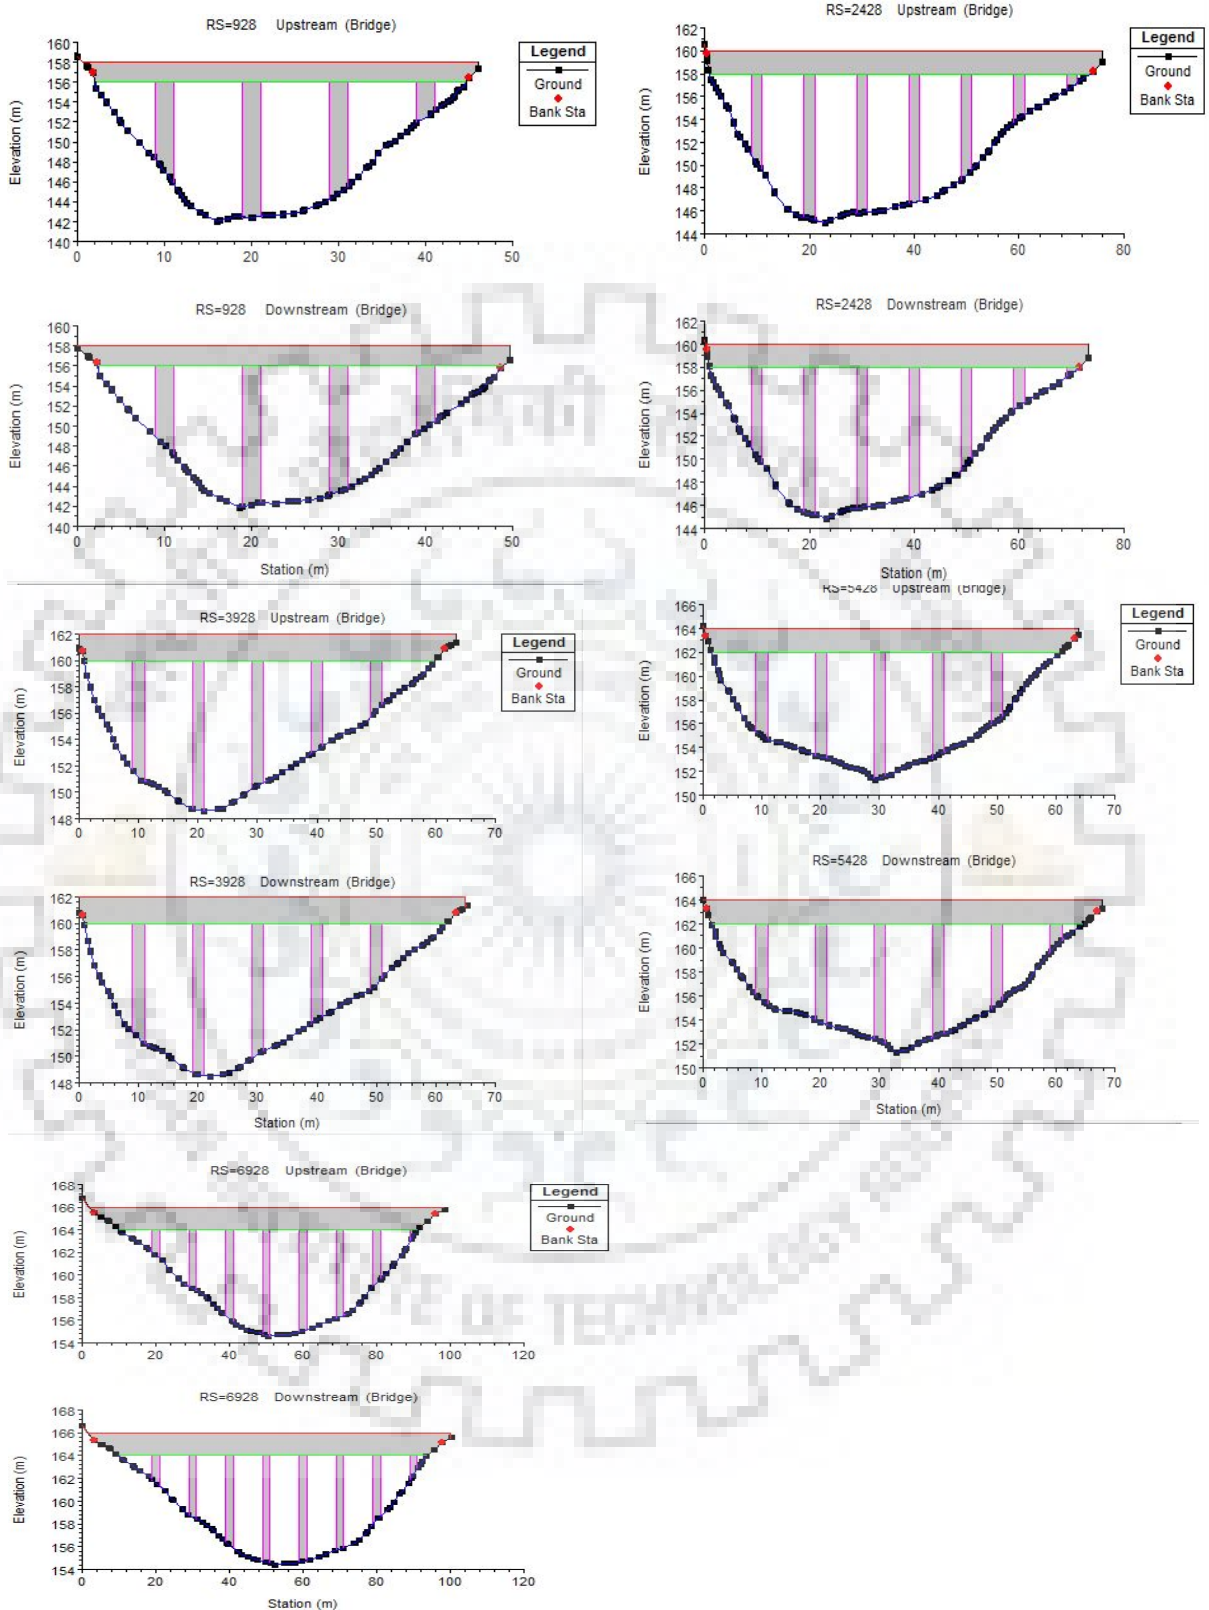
Cross Sections at Bridge Locations (River Stations 928, 2428, 3928, 5428 and 6928 m)
